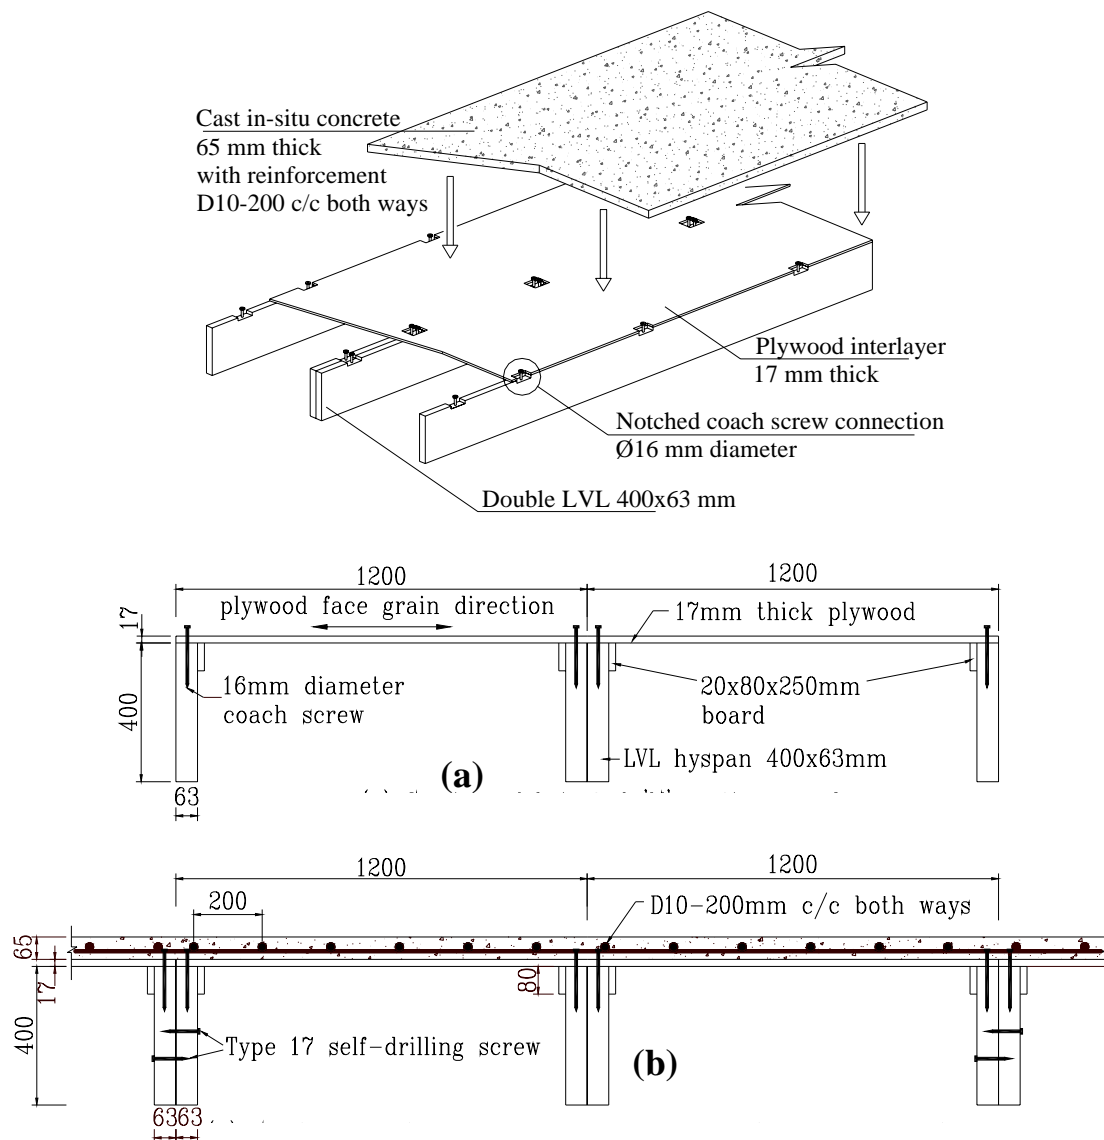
Semi-prefabricated LVL-concrete composite floor system (top): (a) Module M 2.4 m; and (b) Single module connected to adjacent modules using type 17 screw and concrete cast on top
